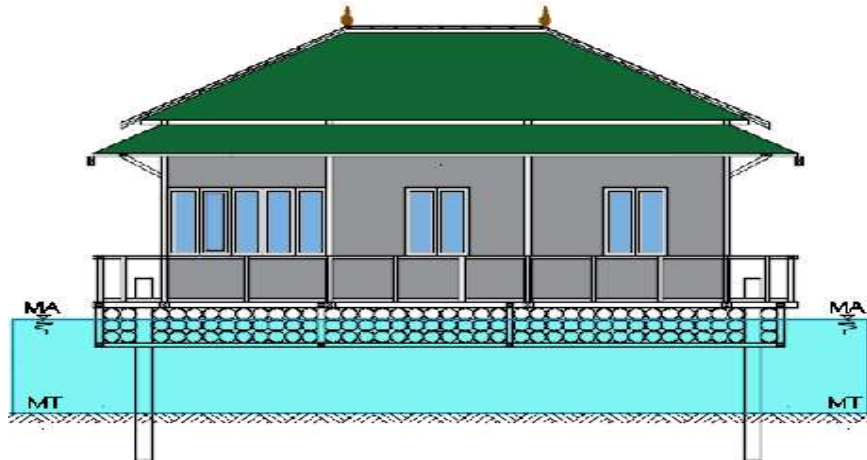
Amphibious House with PVC Pipes Platforms
